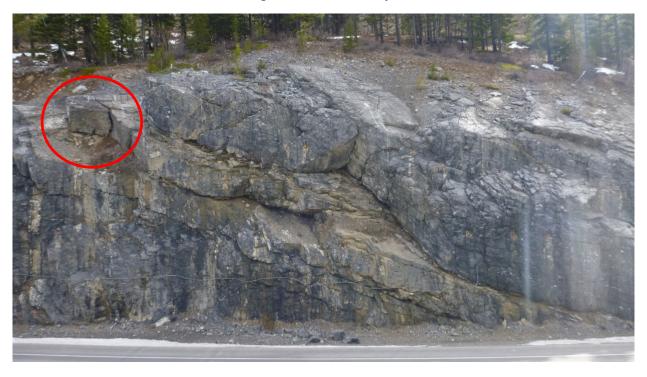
Central portion of east rock slope. Photo taken facing east on May 7, 2019.
